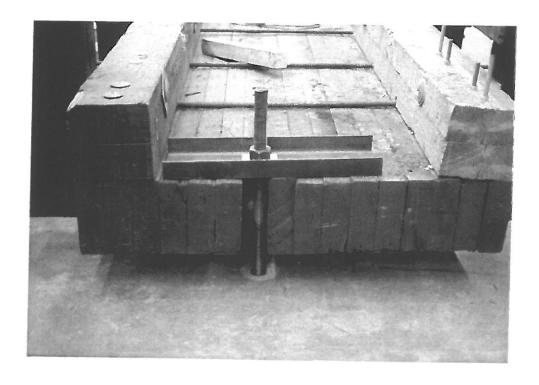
Picture of the New Connection of the Specimen to the Floor
